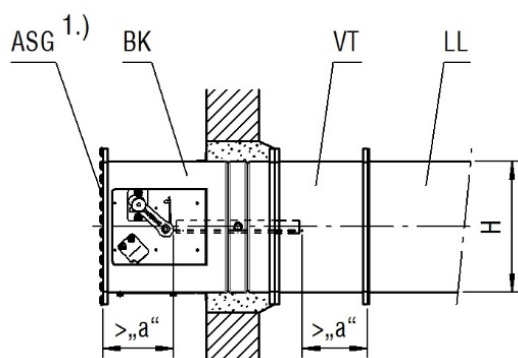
Connection example of a ventilation duct arranged on one side and security grille
